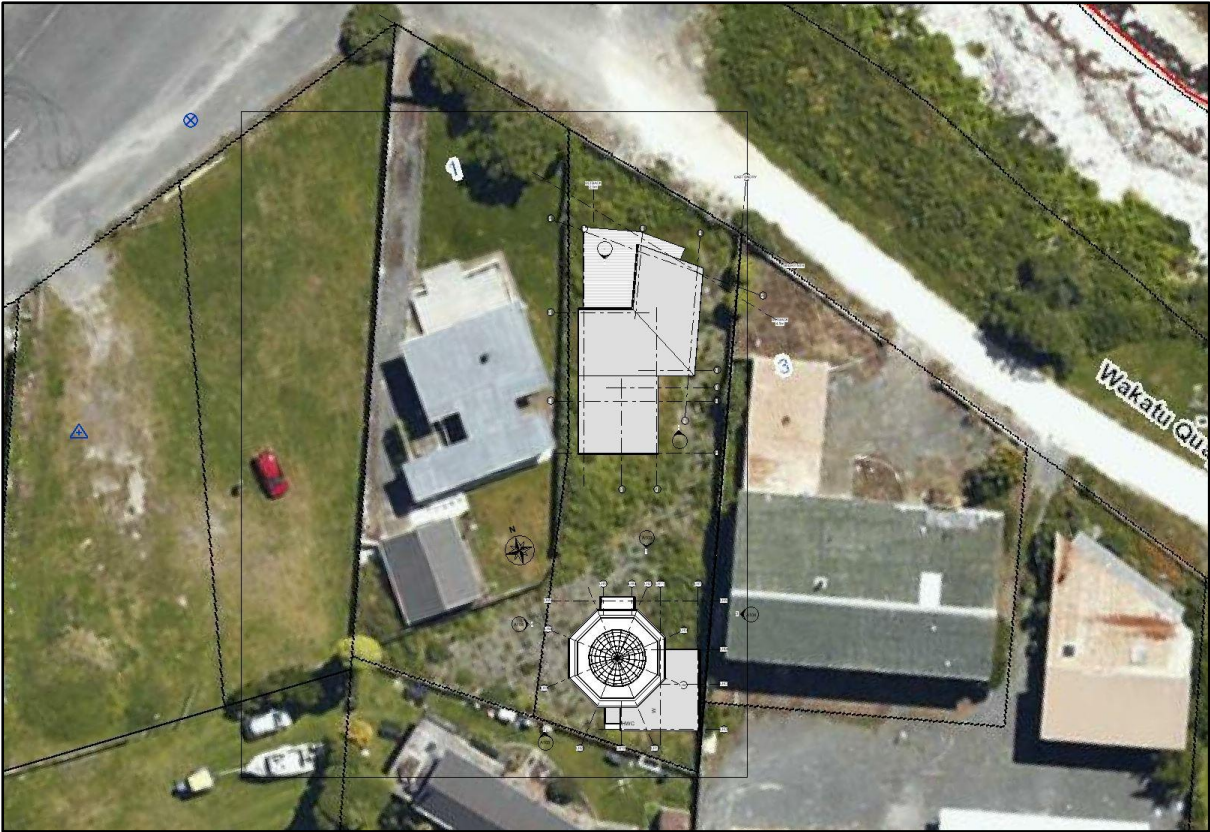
Aerial view of proposed building layout (supplied by Tania Ross)
